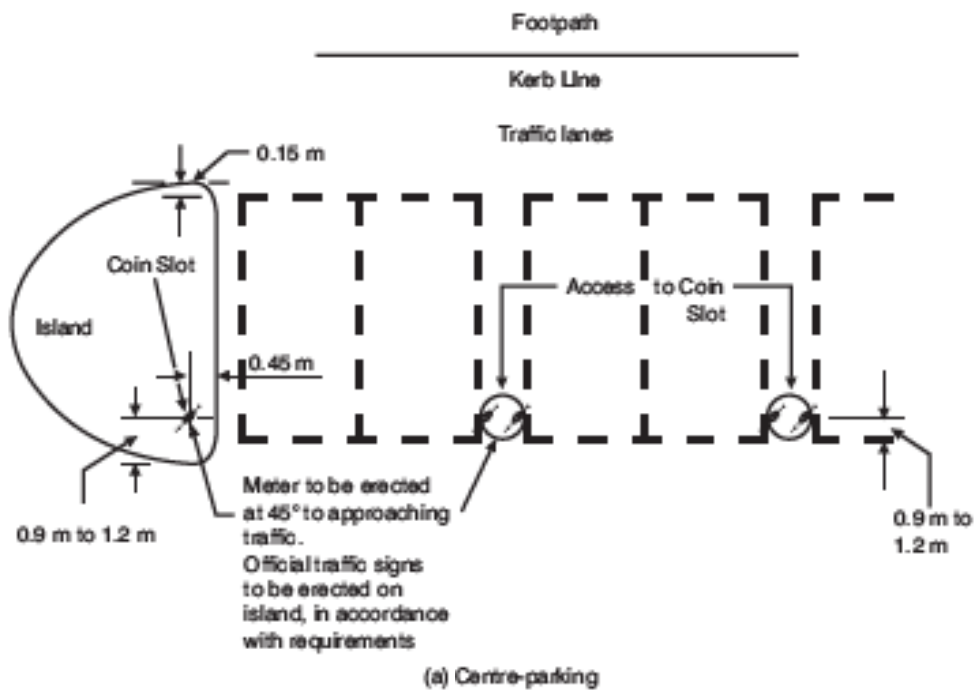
ERECTION OF PARKING METERS FOR CENTRE-PARKING – TYPICAL ARRANGEMENT
